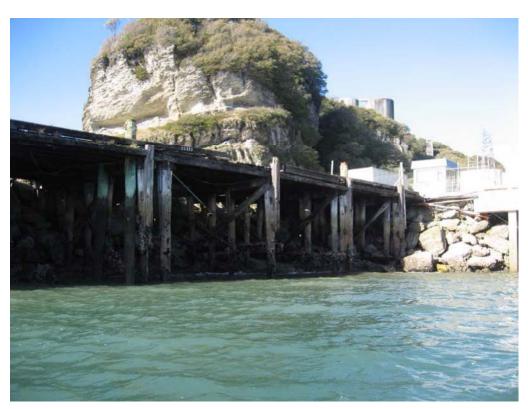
Showing large section loss in horizontal timber member of fender system.
